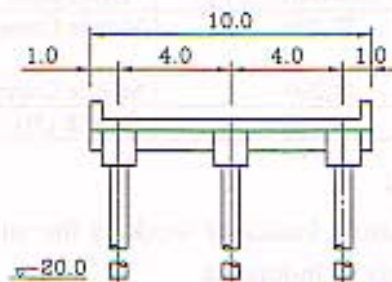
Typical Section of Pontoon Facility (Talang Duku)
